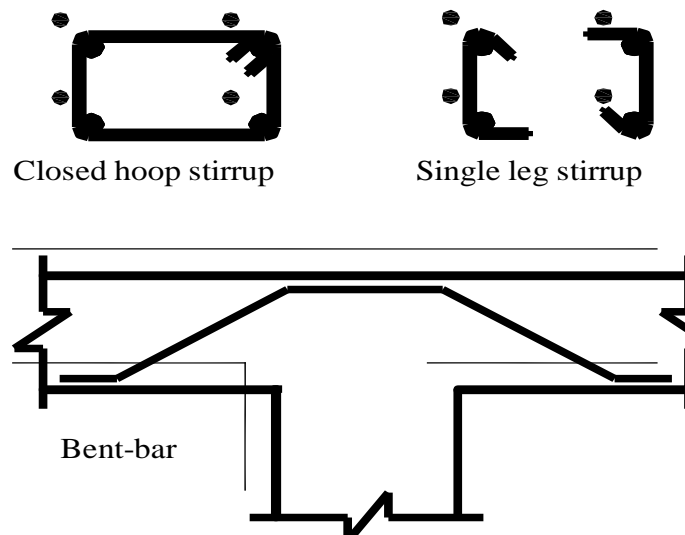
Stirrups and Bent-up shear reinforcement.
